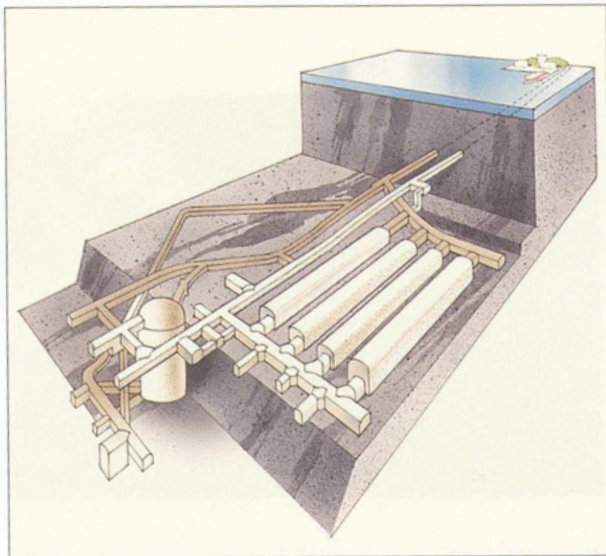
Overview of tunnels and storage chambers in the first construction stage of SFR.
